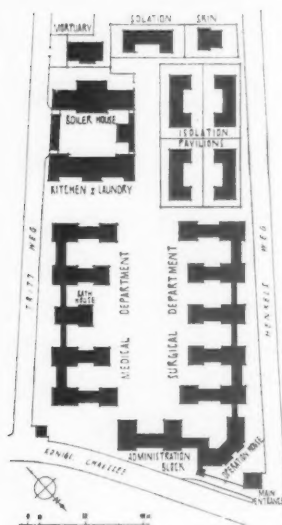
RINDORF MUNICIPAL HOSPITAL: BLOCK PLAN.
